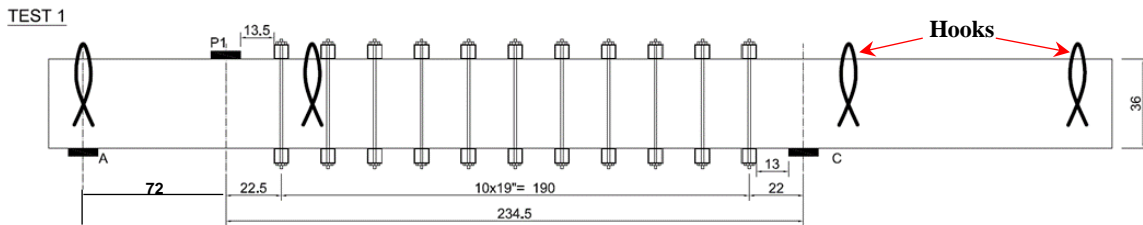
Girder 2 Test 1 configuration (dimensions in inches)
